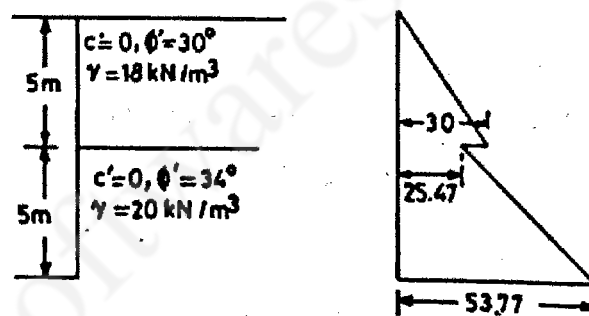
Retaining wall and earth pressure diagram—Example 12.3
